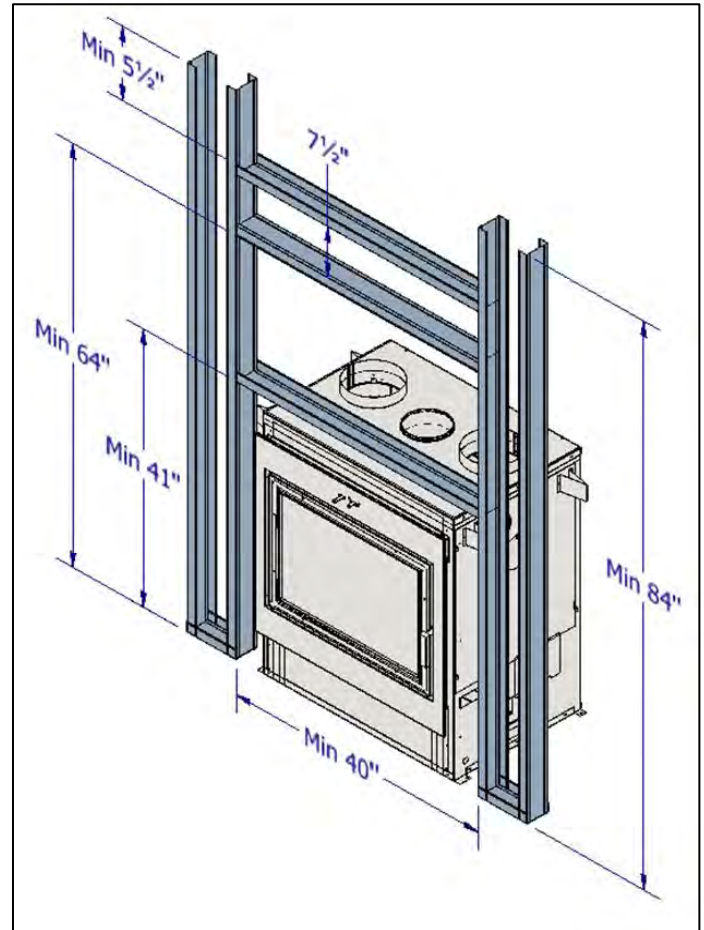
Minimum Framing Dimensions for Single Linear Front Louver Gravity Kit Installations
